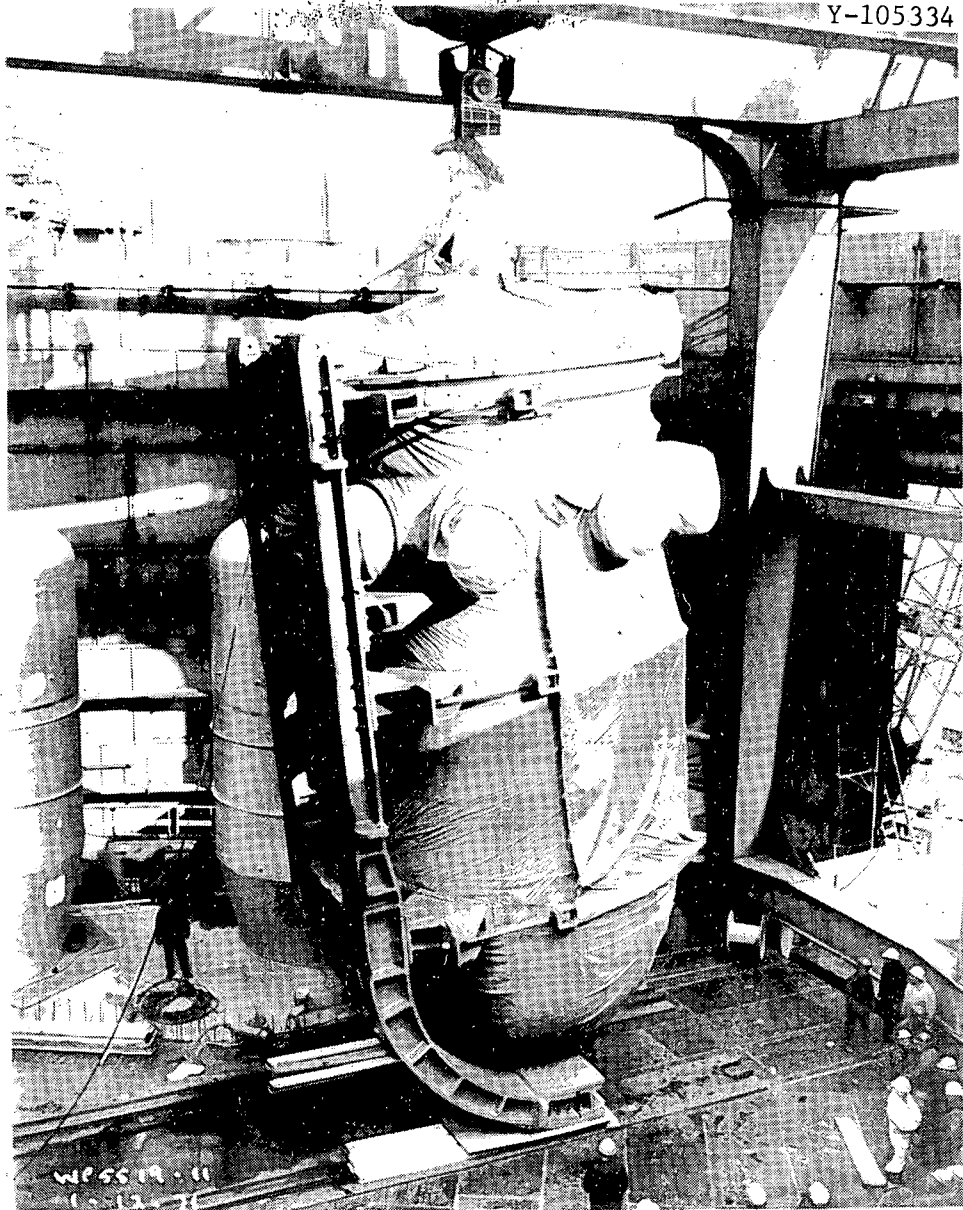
Vessel and Shipping Rig at About 85° Elevation. At this position the lifting operation was halted to allow the crane motors to cool. Vessel, crane hook, shipping rig, and covers weigh about 456 tons.
